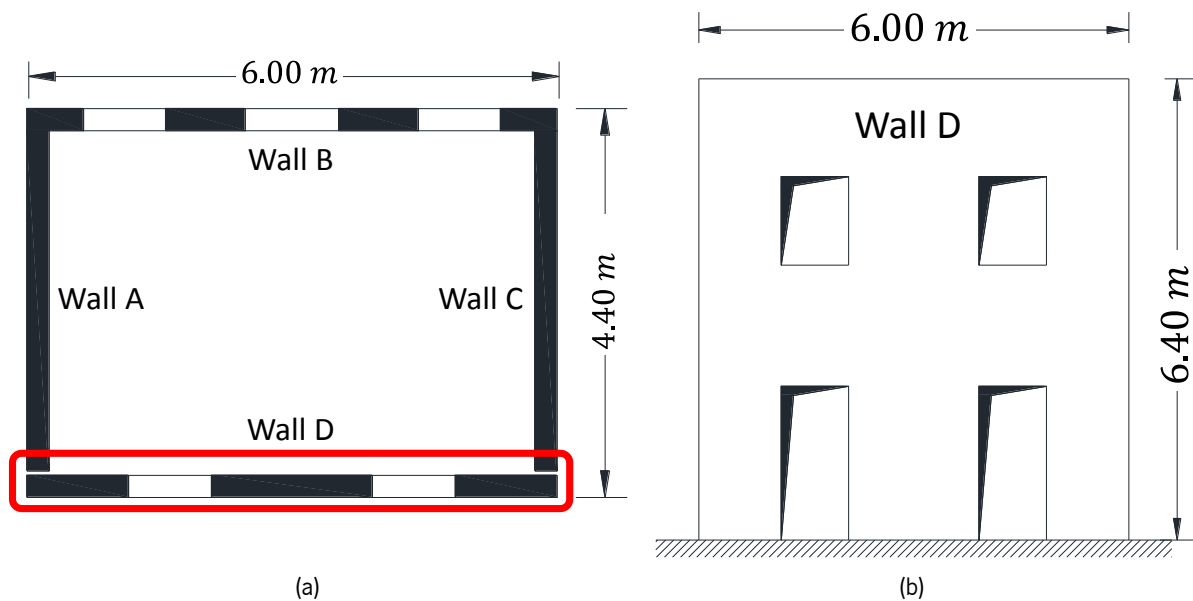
Two-story masonry building: (a) plan view, and (b) Wall D.
